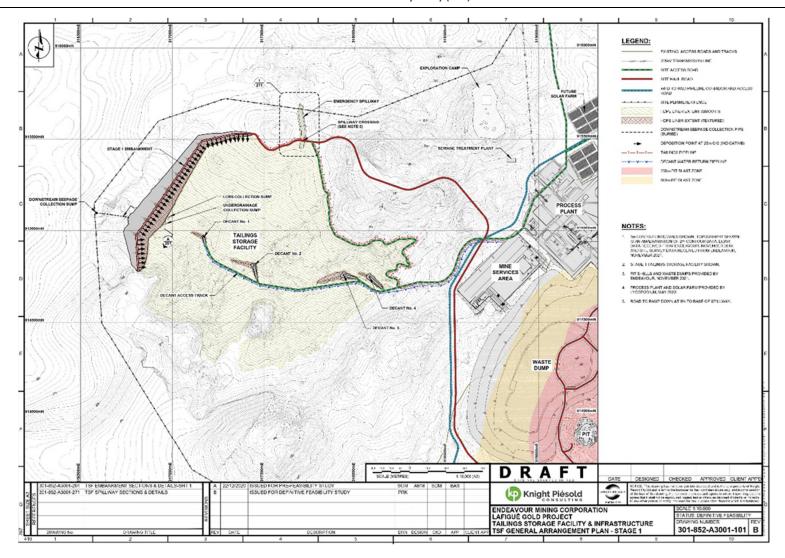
TSF Stage 1 Layout (KP, 2022b)
